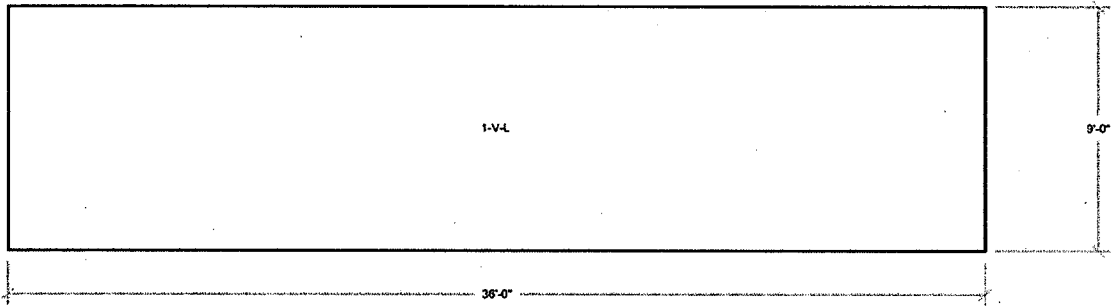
H.7-14: Tunnel Walls Looking From Outside Vertical Reinforcement Zones Far Side Face
